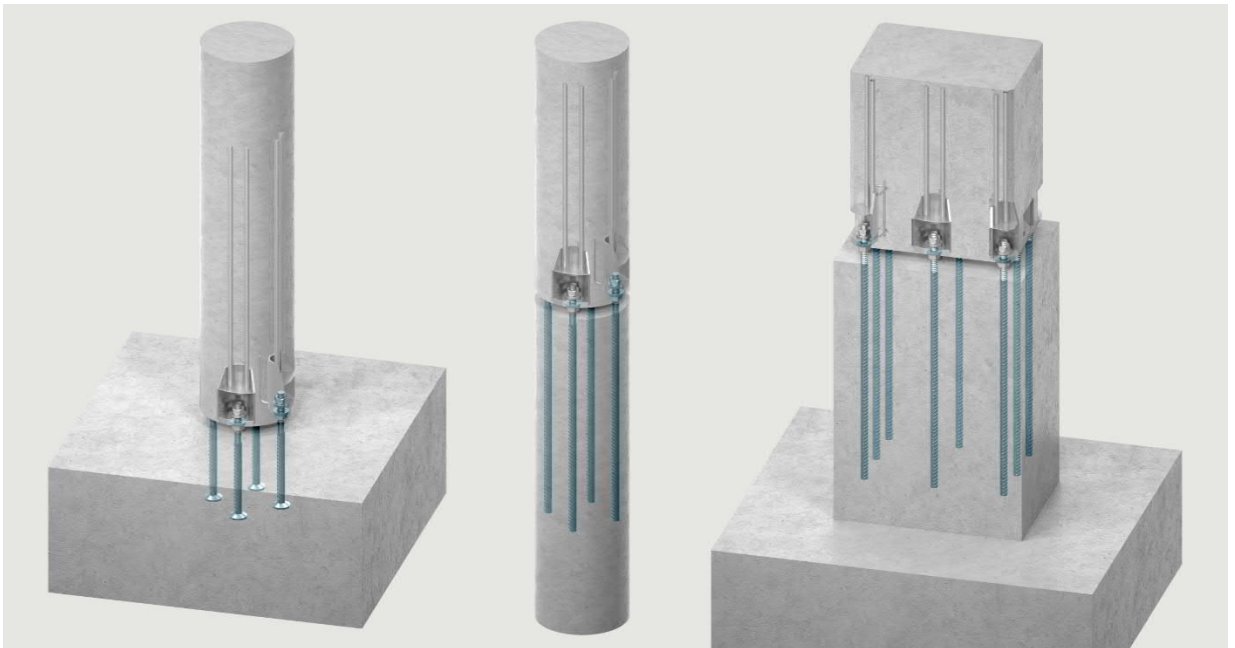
Rebar bolt connections in concrete columns with AHK® shoes
